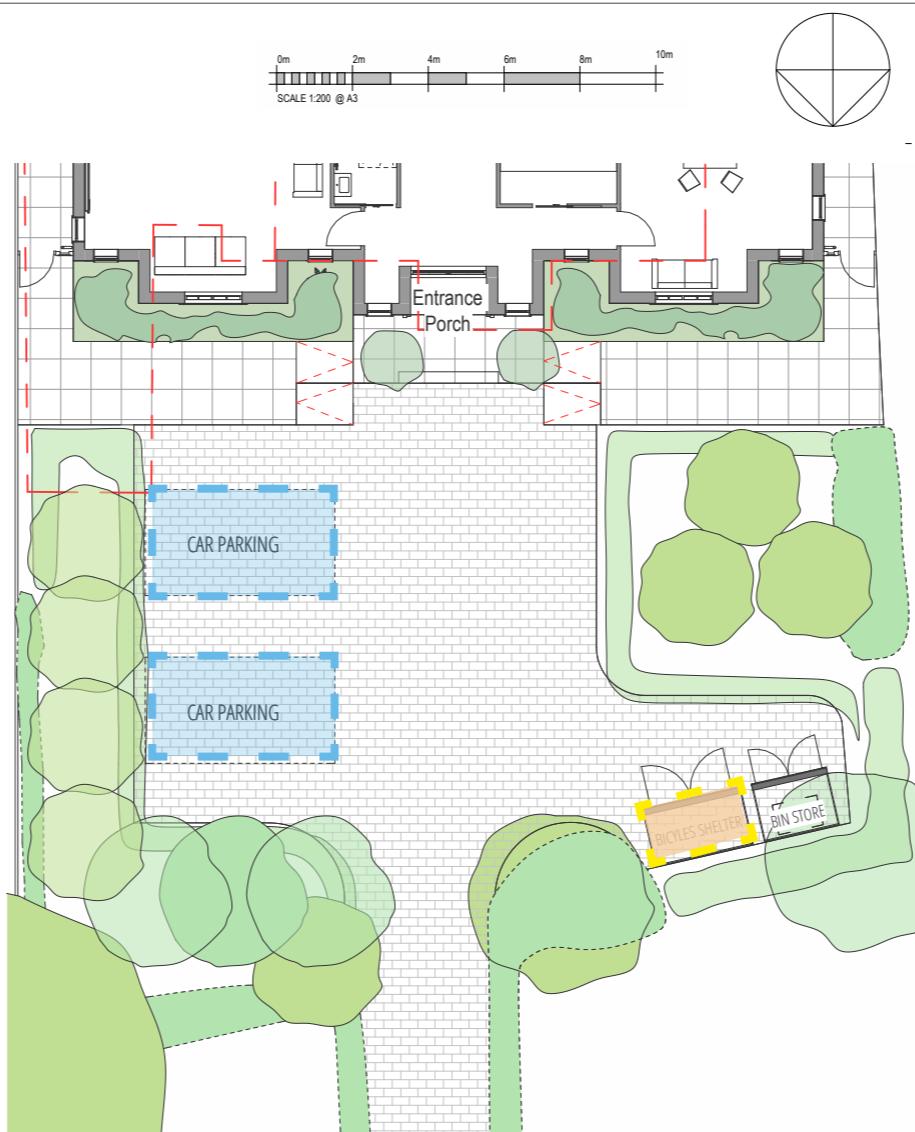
Ground Floor Plan - Partial - 1:200@A3
